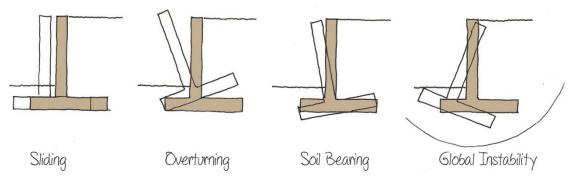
Classical retaining wall failure mechanisms
